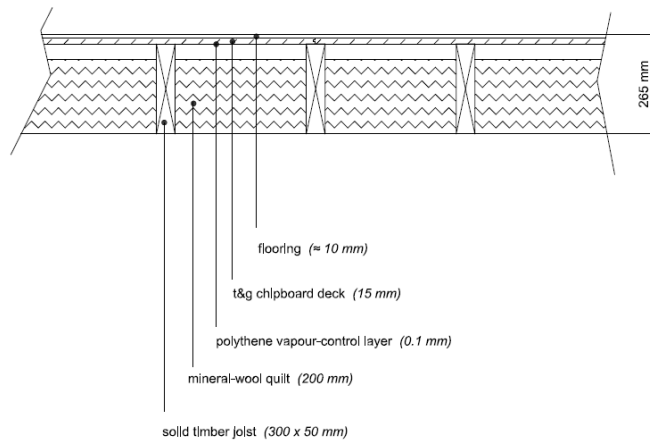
Ground floor TF (timbre frame), cross-section.
